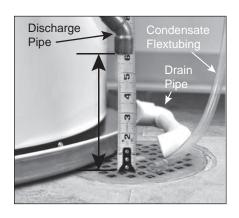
The end of the T&P Relief Valve discharge pipe must stop no more than 6" (15 cm) b ove a floor dra n or outside.
